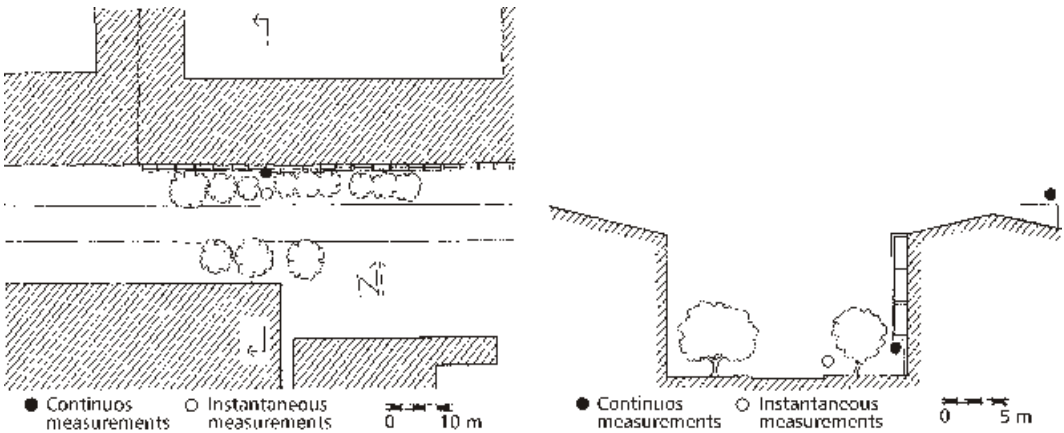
Plan and section of the University of Moratuwa (UoM) site (School of Architecture) showing the position of the measurement equipment.
